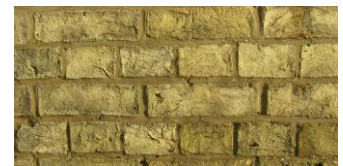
"Gault bricks" used for Council housing in Akeman Street, c1930
